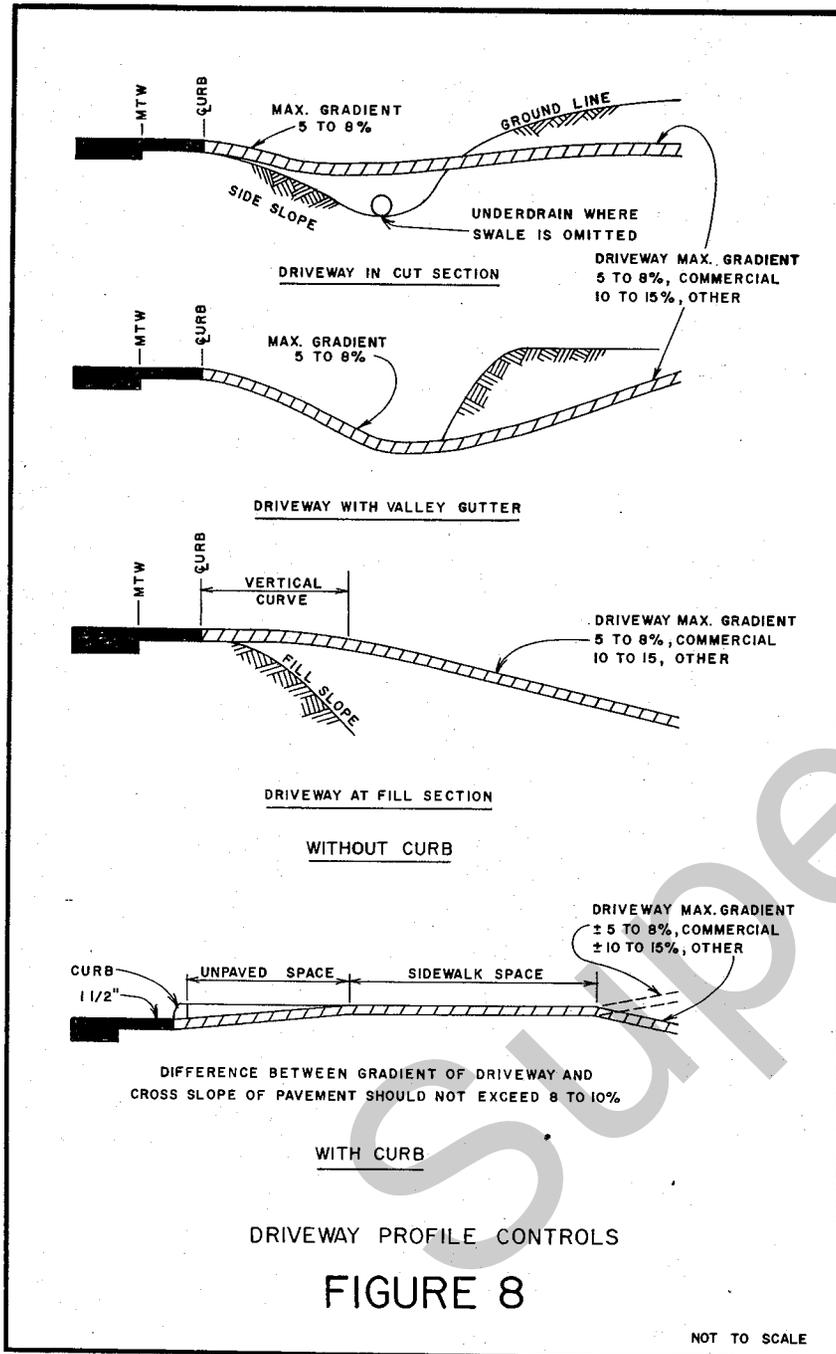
DRIVEWAY PROFILE CONTROLS: This sketch shows typical driveway profile controls. The use of a swale or pipe underdrain for proper drainage of uncurbed portions of highways is indicated. The bottom profile shows a driveway sloping upward to the sidewalk to assure proper drainage. Beyond the sidewalk the driveway may slope either upward or downward depending upon the topography at the site. Where curbs are used along the roadway and sidewalks are provided or contemplated, the gradient of the driveway usually should fit the plane of the sidewalk. If the difference in elevation of the gutter and the sidewalk is such that this is not practicable, then the sidewalk should be lowered to provide a suitable gradient for the driveway. In such case, the surface of the sidewalk should be sloped gently from either side of the driveway. Vertical curves on driveways should be flat enough to prevent dragging of vehicle undercarriage.
